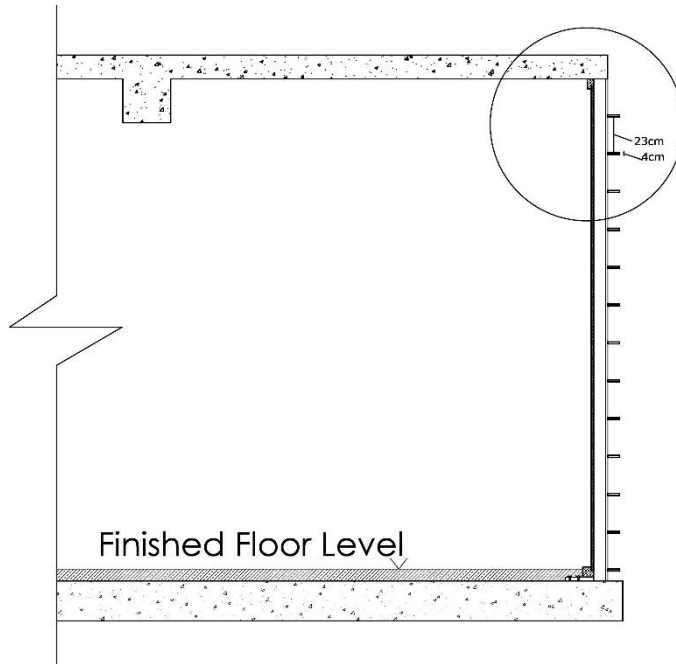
Full height section of the floor with horizontal louvers at different offset from west façade
